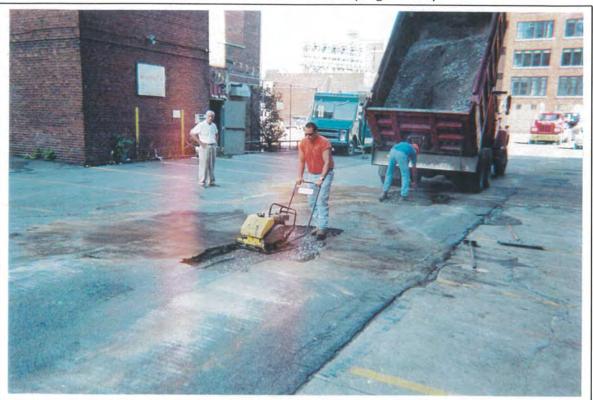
Test pit TP-5 showing typical select fill placement and compaction.
